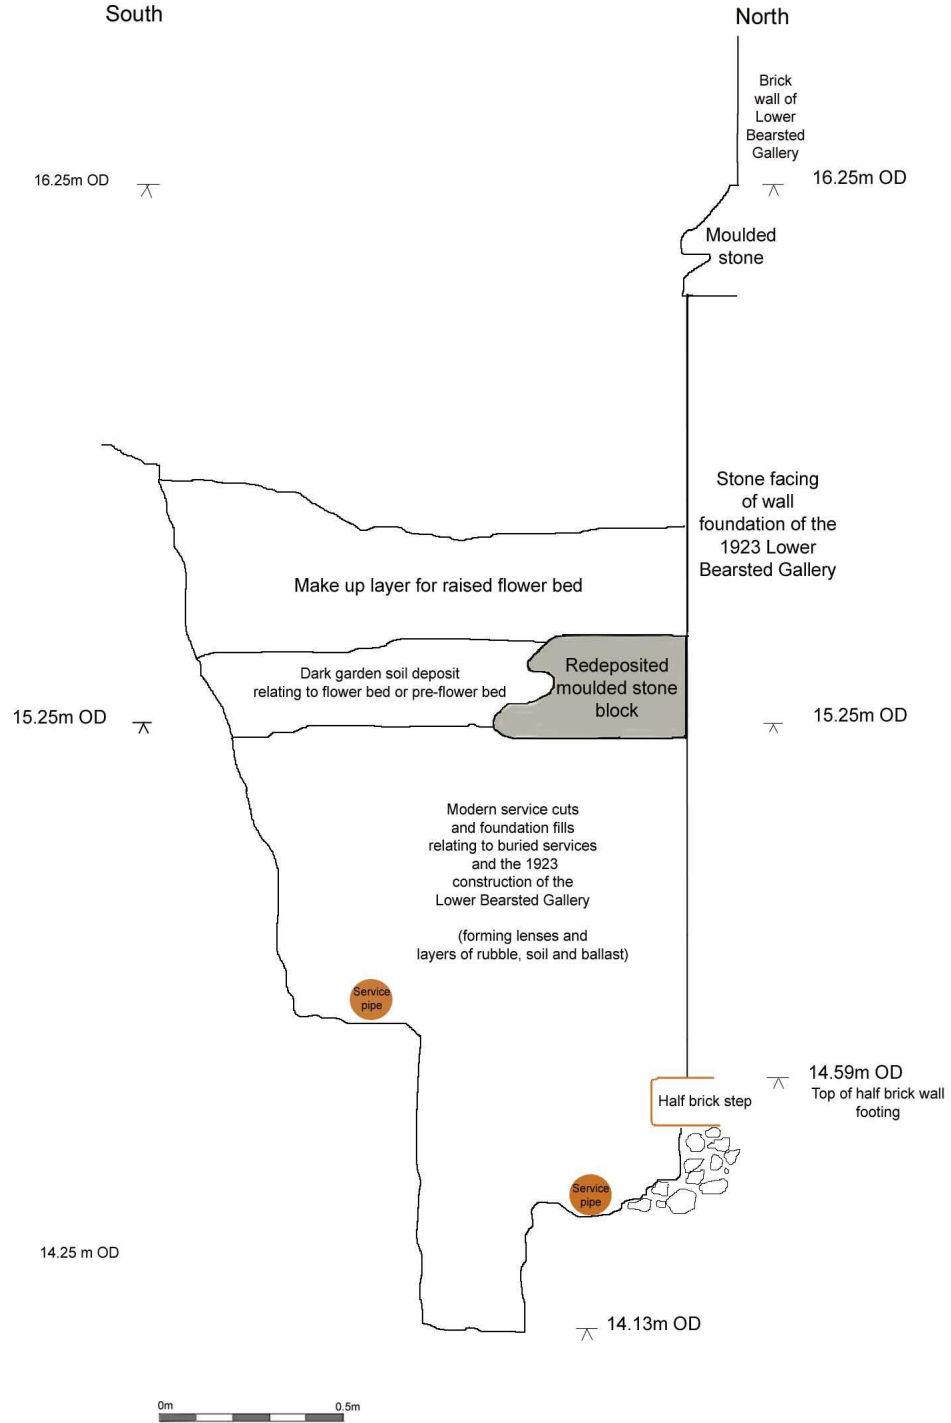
Section through Test Pit 2, showing the western elevation (east facing section).
